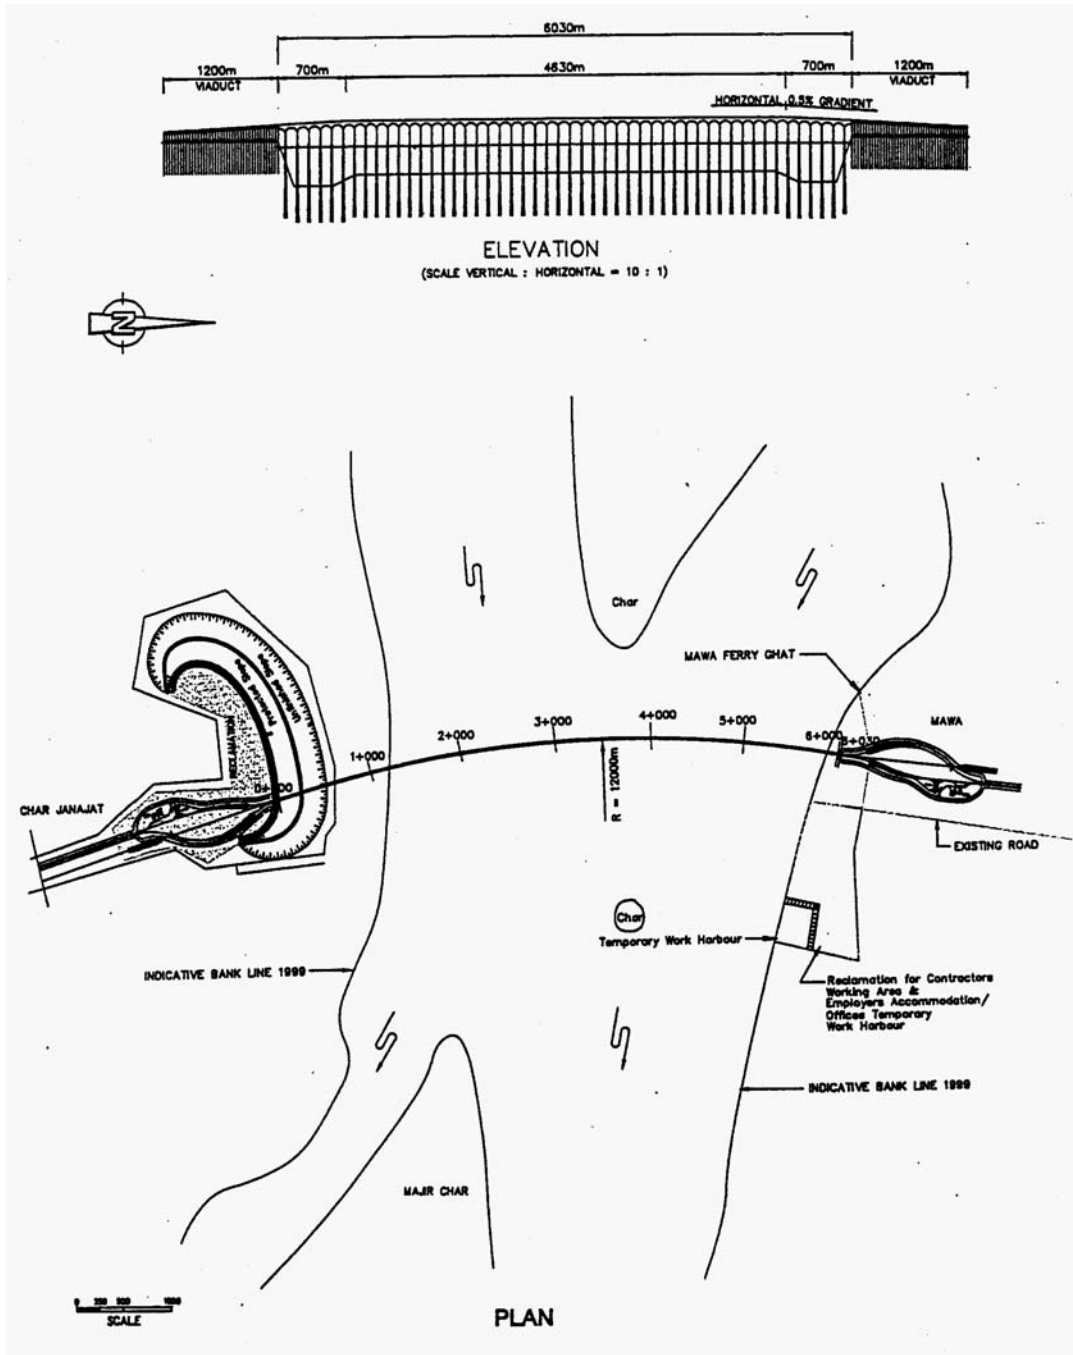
(a) Padma Bridge at Mawa (Pre-F/S): Elevation and Plan
